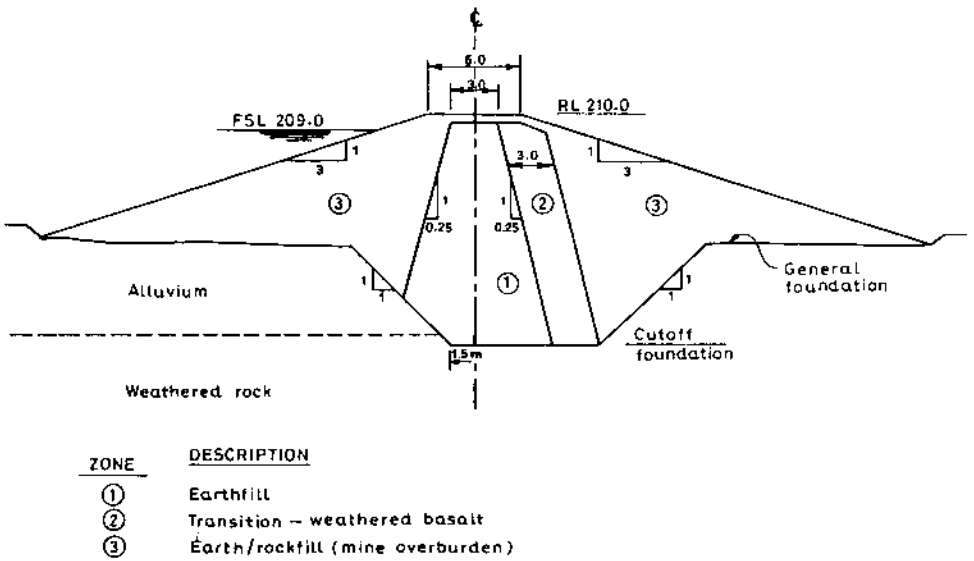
Water storage dam, Blair Athol Mine (courtesy of Coffey Partners International).
